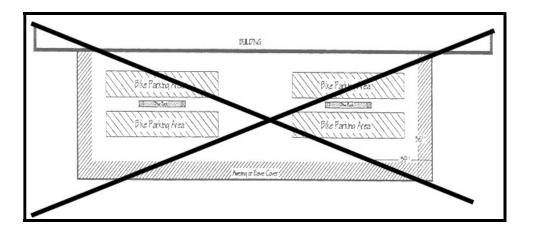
I.10.b Covered Bike Parking Layout
